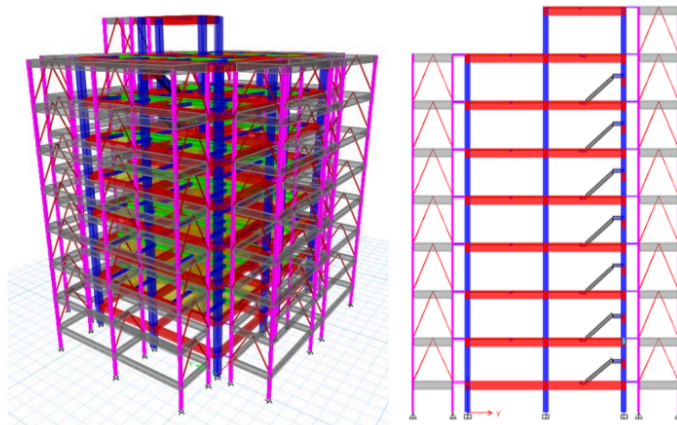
3D view and elevation of V-braced exoskeleton.
